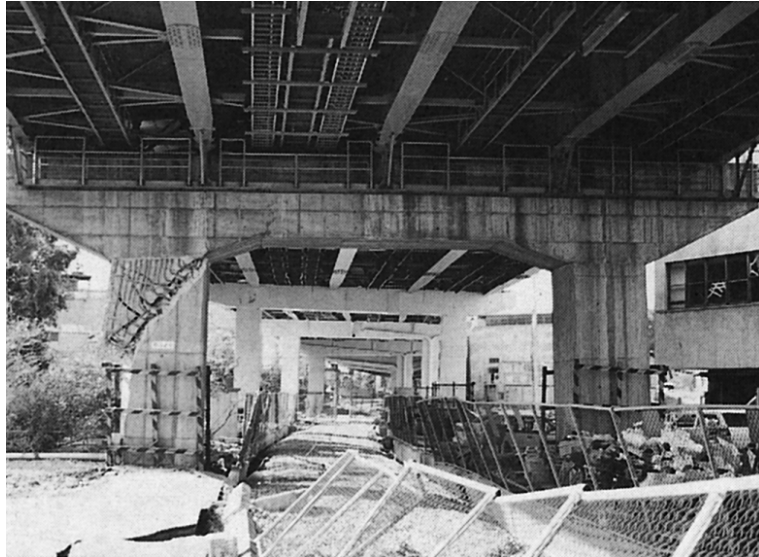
Bending and Shear Type Damage of Flame Type Piers
